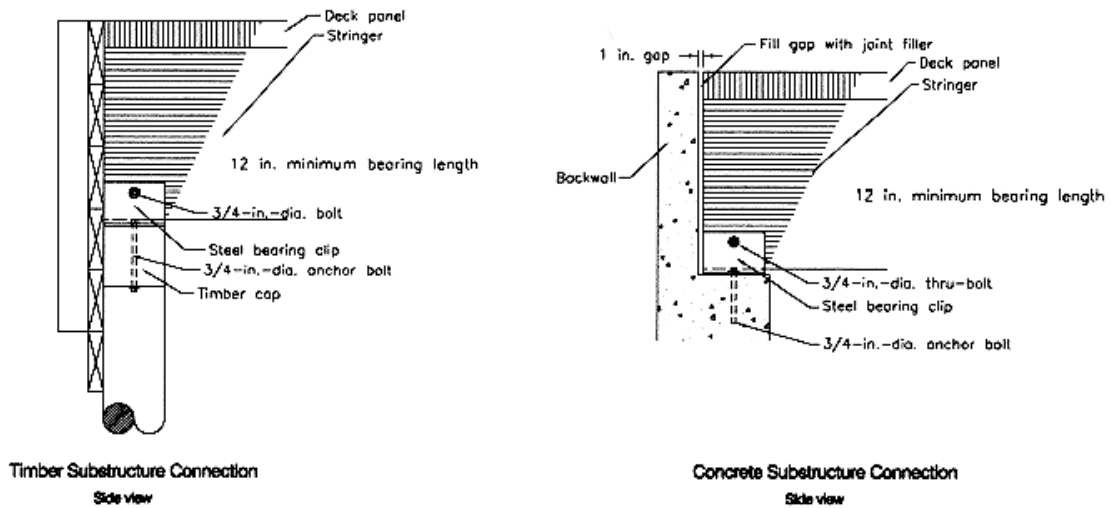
Glulam Timber Bridge Abutment Connections (Wacker and Smith, 2001)
